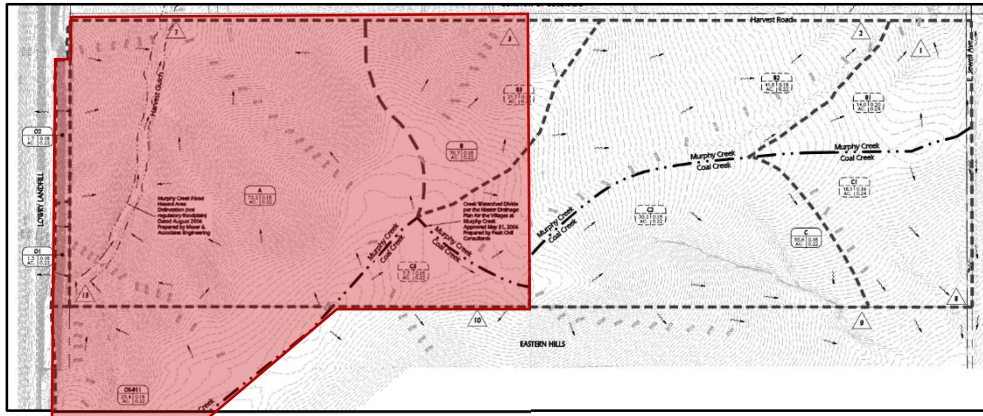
Snip of Master Drainage Plan (Full size in Appendix A-1). Red boundary indicates onsite area and offsite flows tributary to site.
